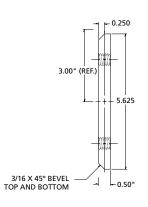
" x 6" RAIL WITH WELDED PLUG SIDE ELEVATION
